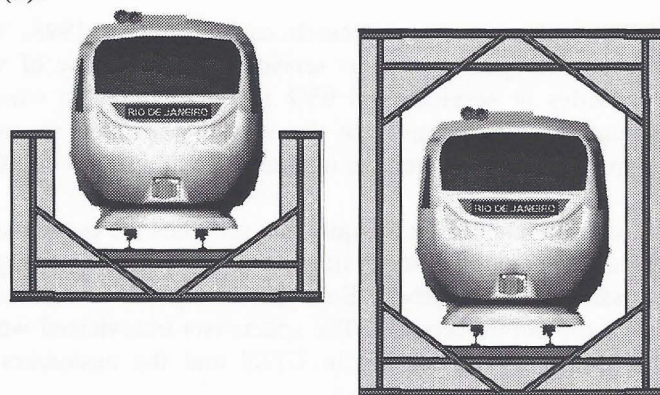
(a): LRV in pony plate girder and (b) LRV in through truss
